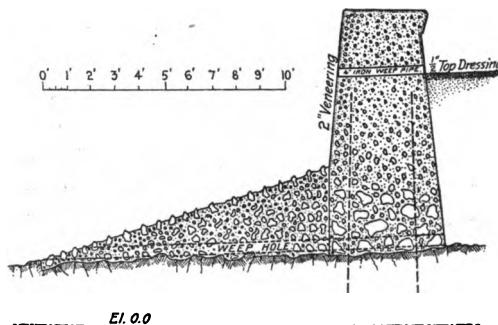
Section Showing Sea-Wall Building at Havana, Cuba.
